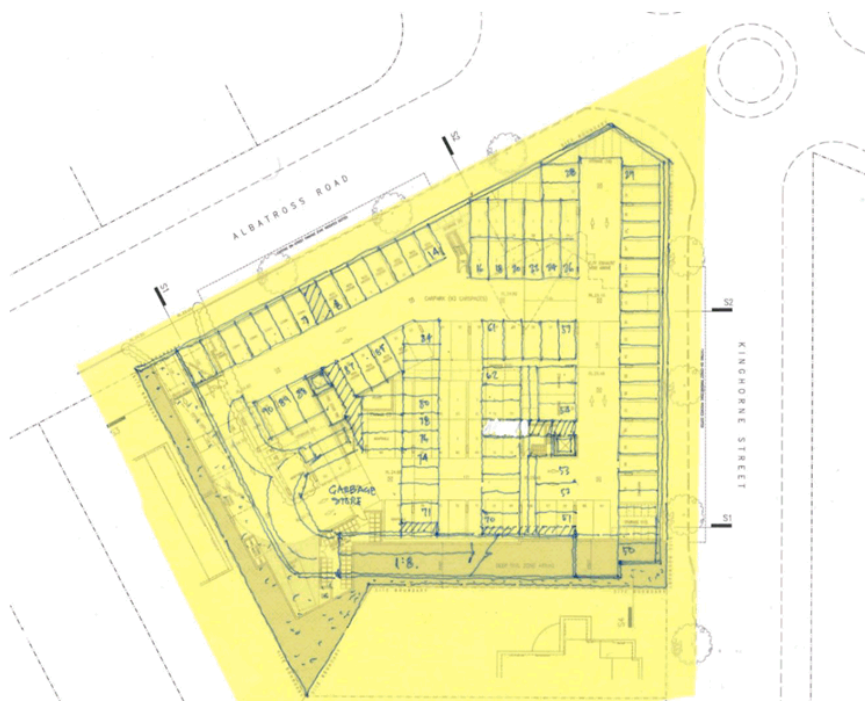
applicant's submitted concept plan, demonstrating that access via Kinghorne Street is capable of being achieved.
